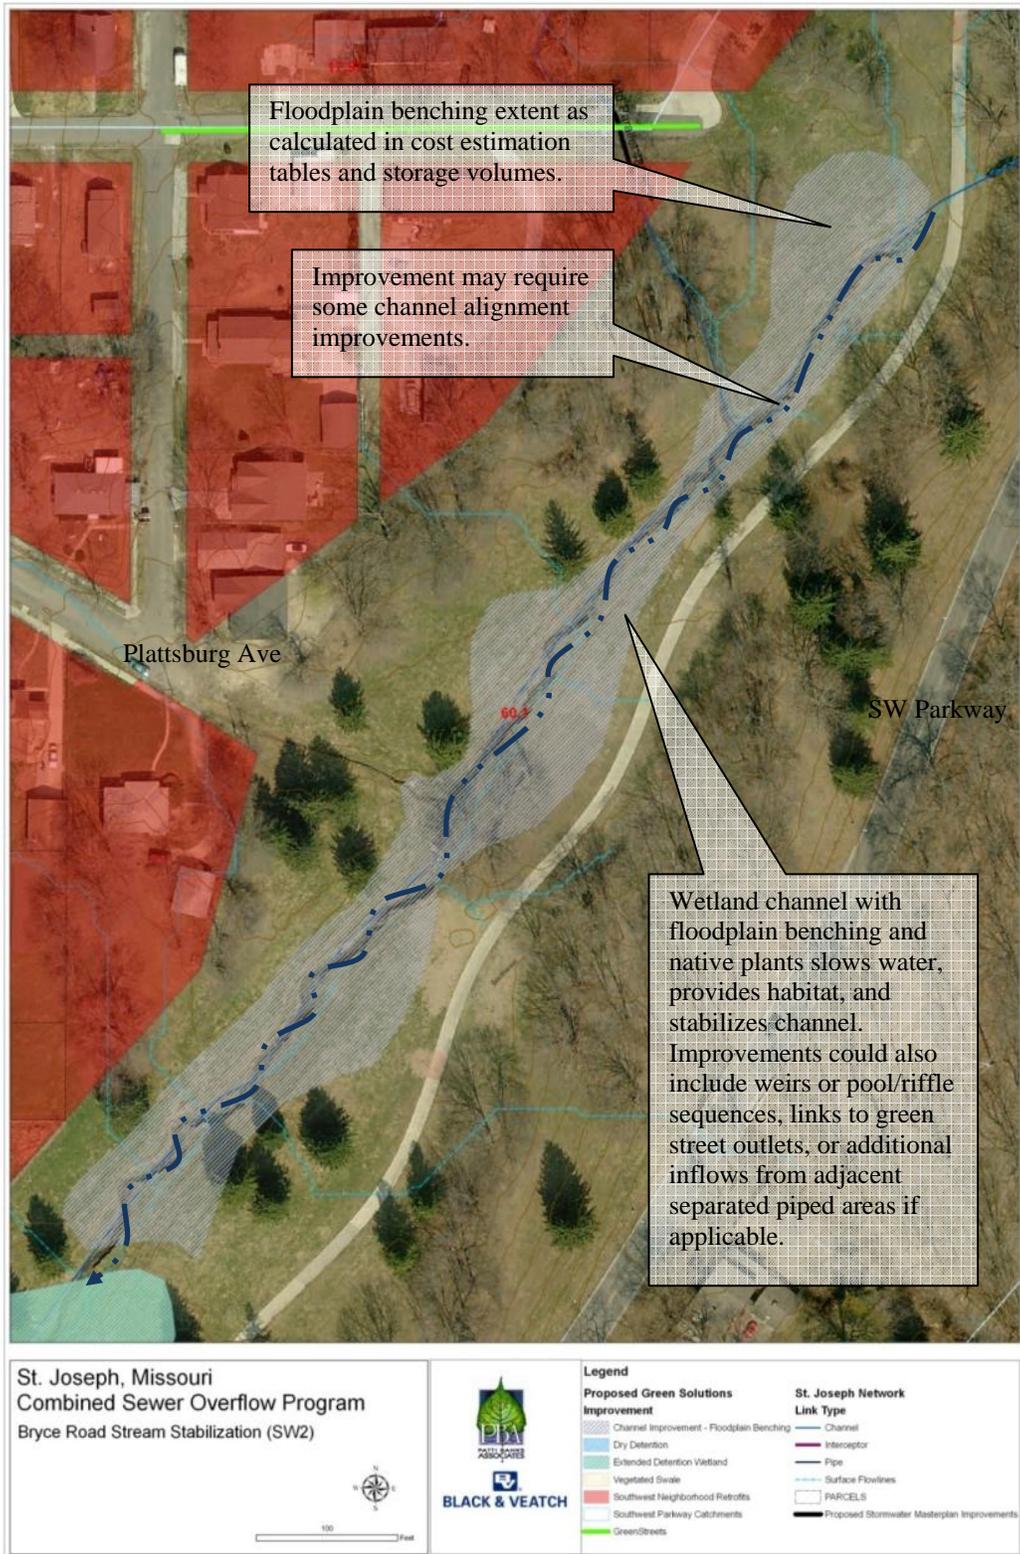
Southwest Parkway Stream Stabilization at Bryce Road (SW2)
